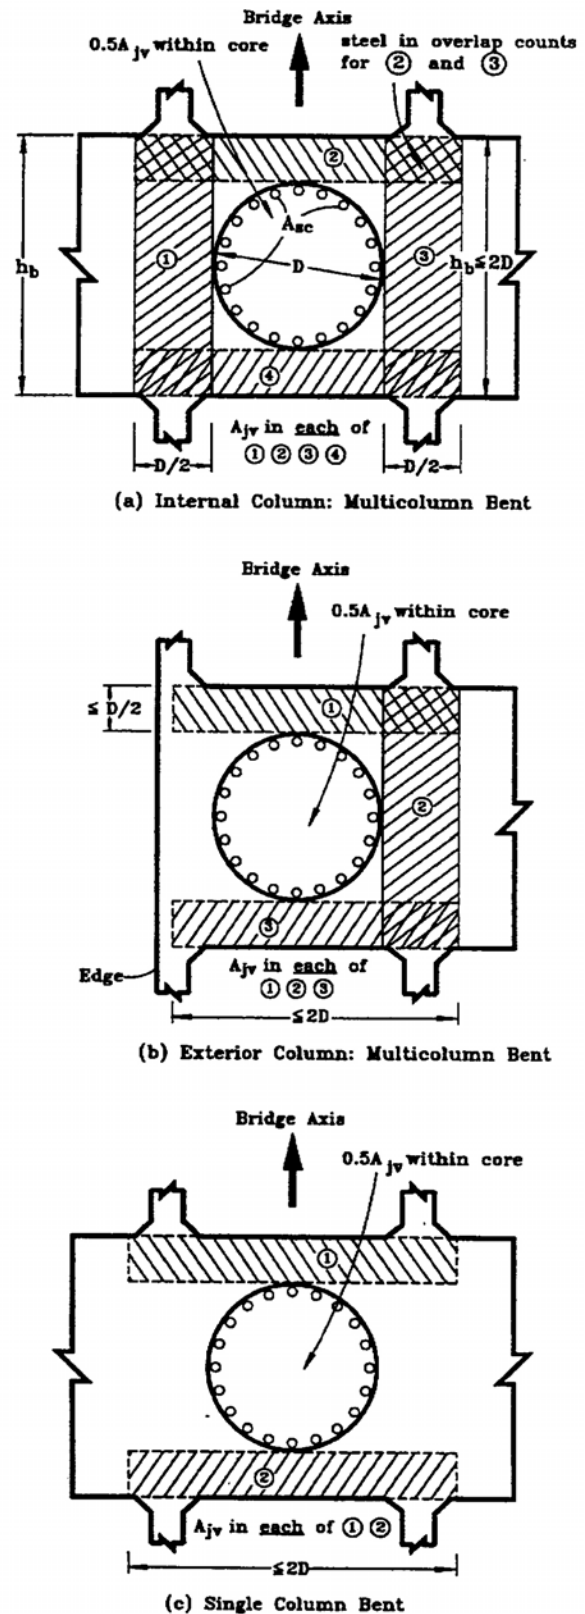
Locations for Vertical Joint Reinforcement.
